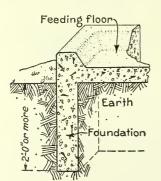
A concrete curtain wall or apron under a feeding floor prevents raveling of earth and consequent breaking of the slab, as well as the harboring of rats
